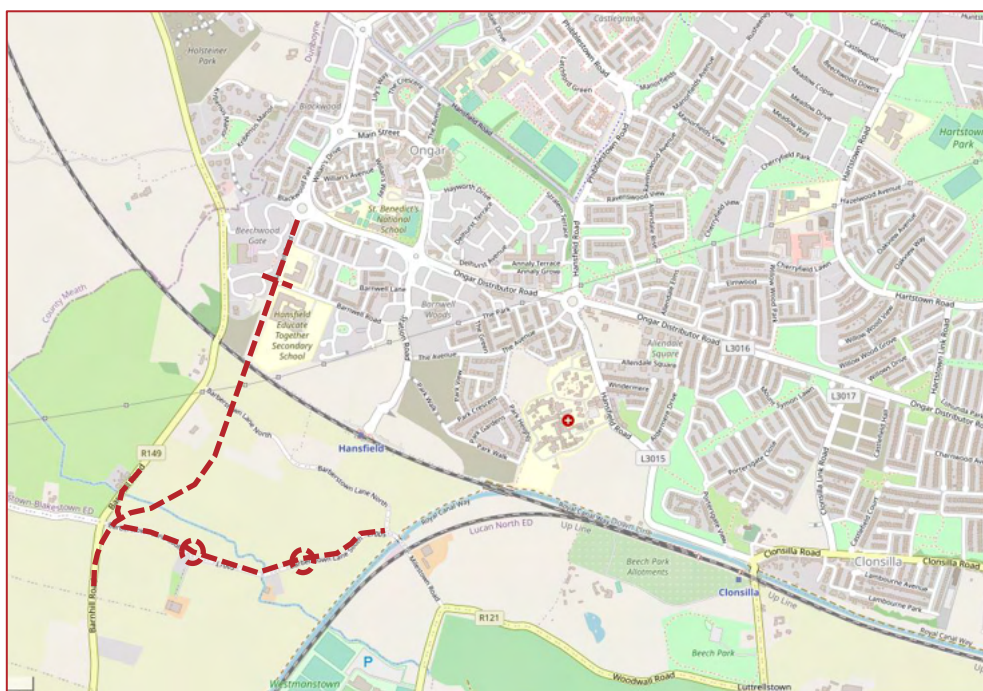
LOCATION PLAN (SOURCE: WWW.OPENSTREETMAP.ORG)
